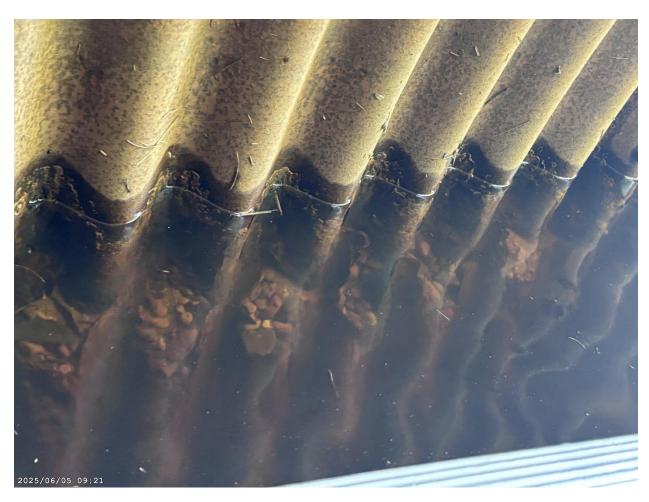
Separation of top and bottom portions of culvert barrel exposing gravel
